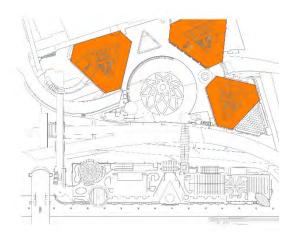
Proposed Landbridge Footprint with Beam Outlines
